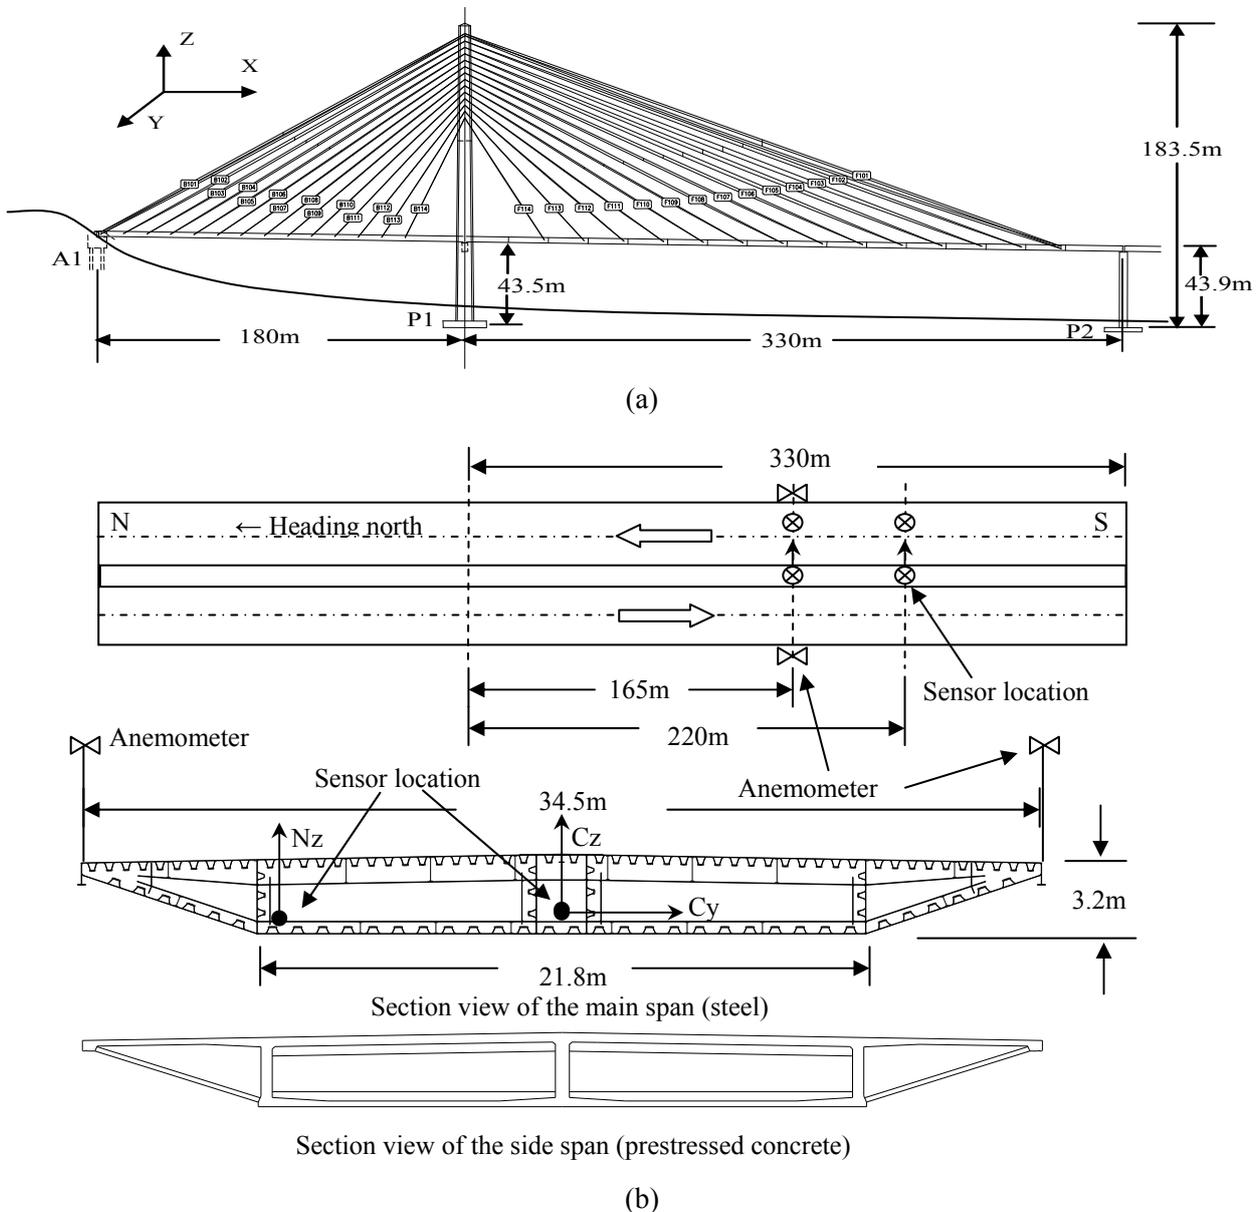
Layout of the Kao Ping Hsi cable-stayed bridge: (a) plane view; (b) sensor locations of the structural monitoring system.
